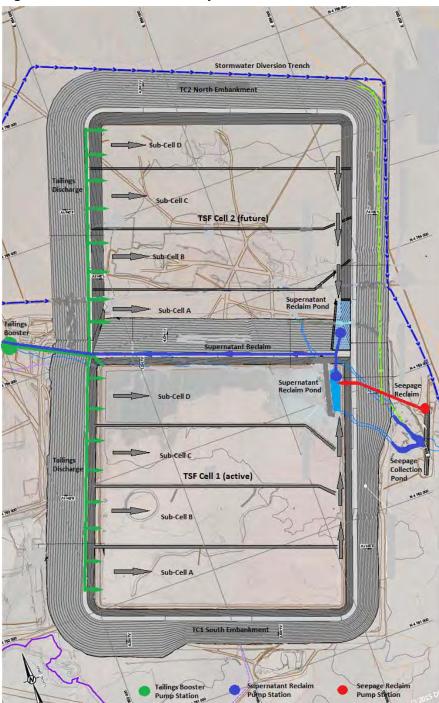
TSF Cell 1 and 2 Layout Plan
